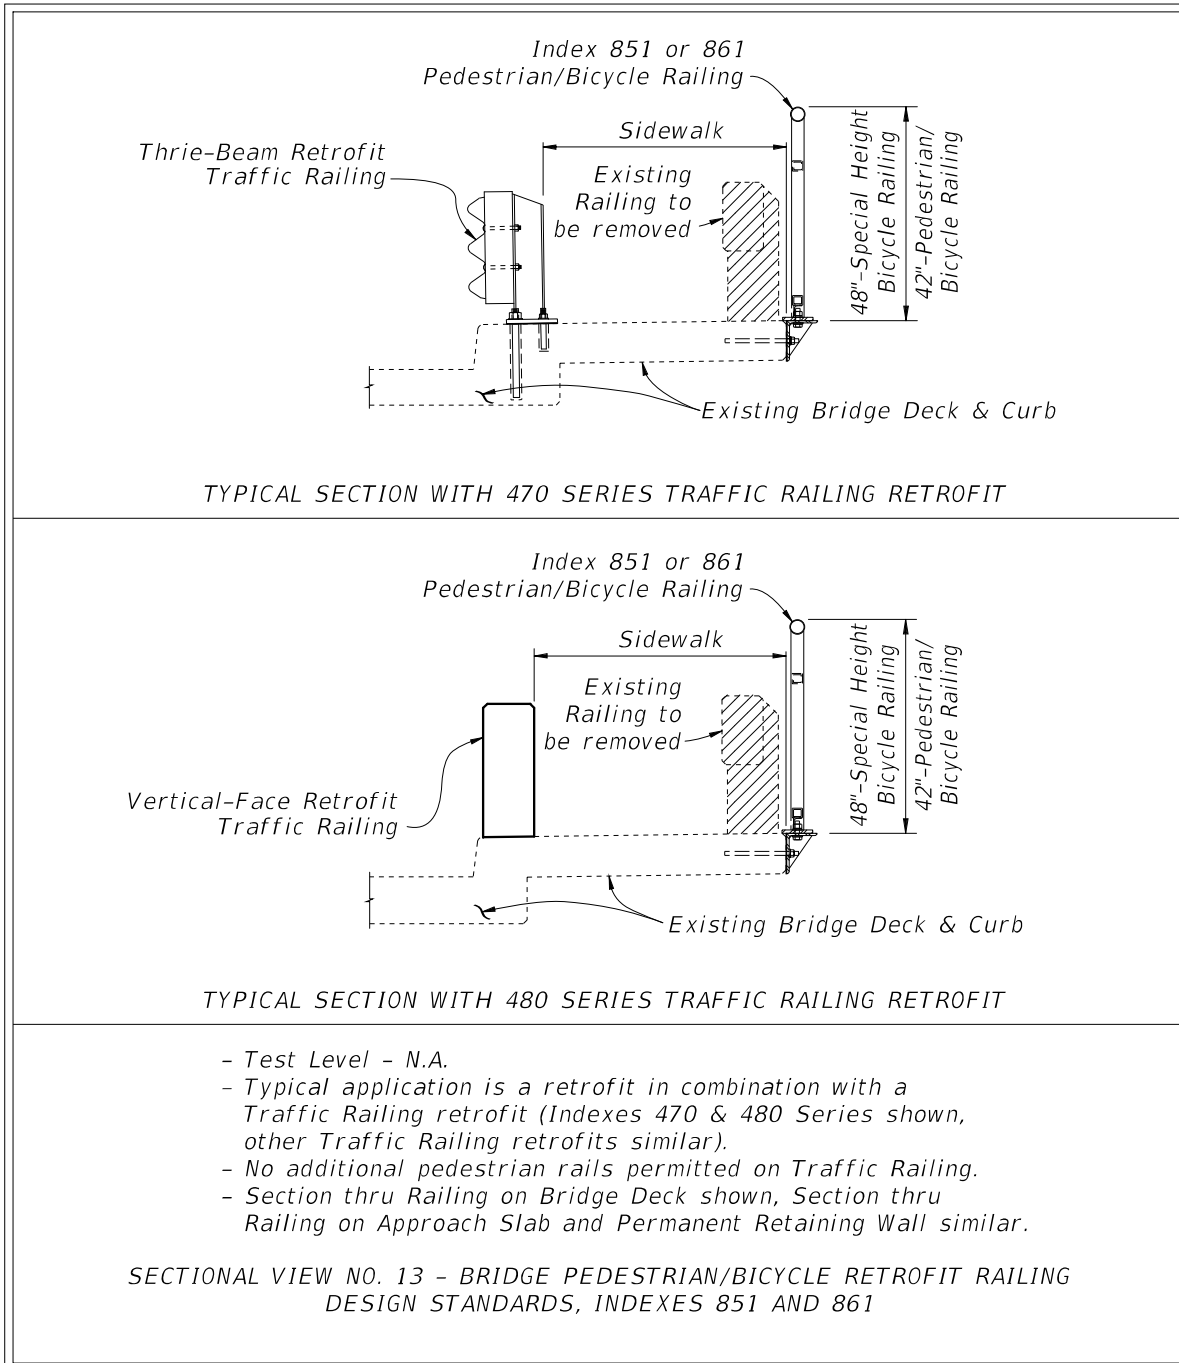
Bridge Railing and Bridge Parapet Fencing
